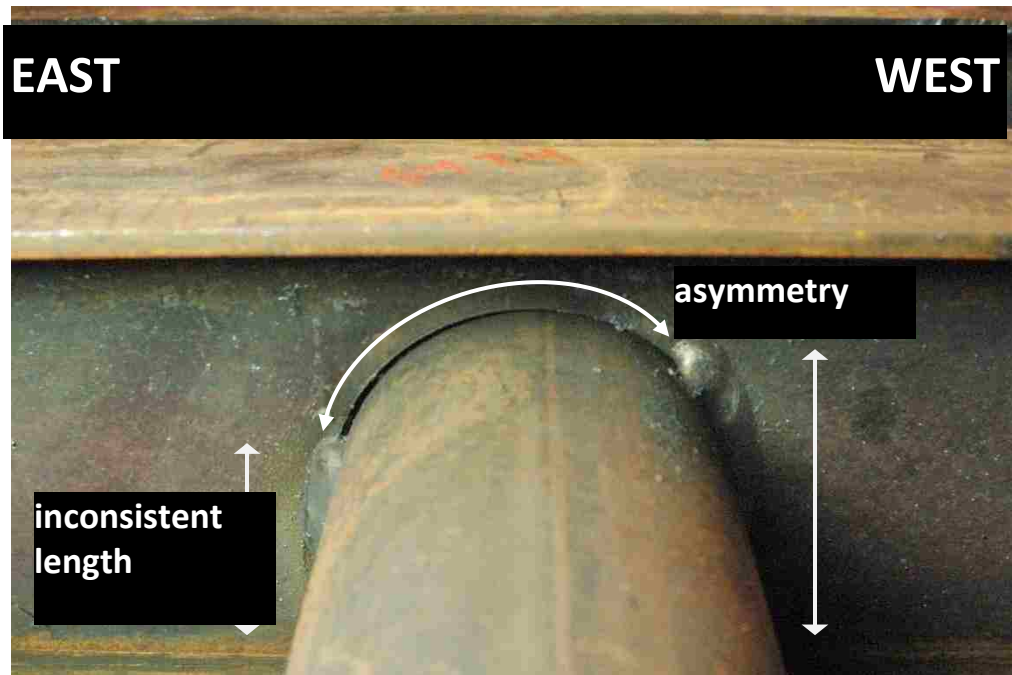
Welds at intersection of S4-T4 in specimen #1
